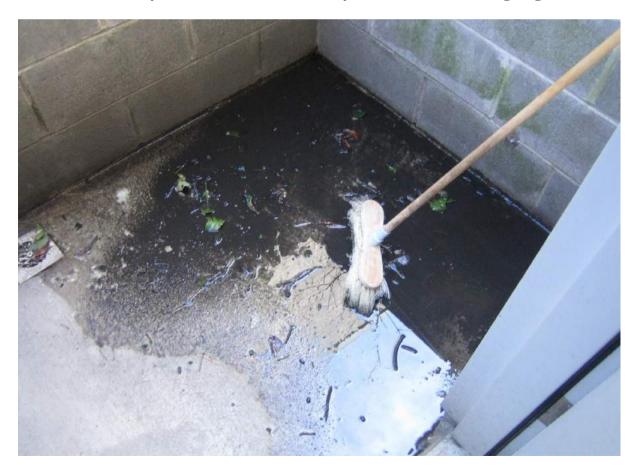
Water ponding on landing to A/C units outside Waste Room in Building B.
